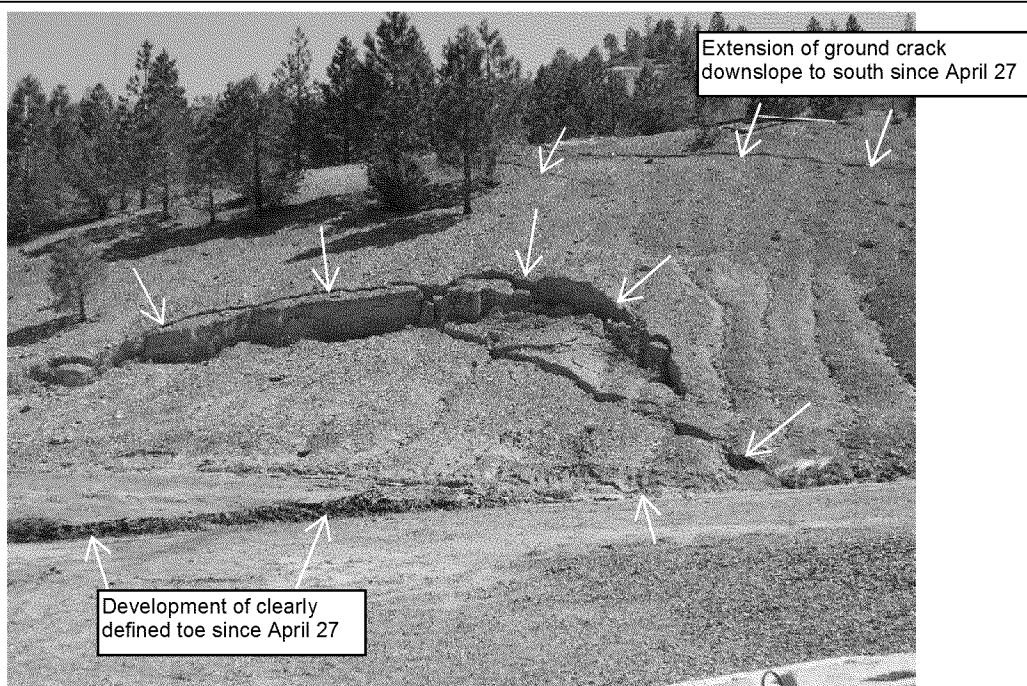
May 11, 2017. Southern end of ground cracking at top of Crusher Road Slope. View looking southwest
